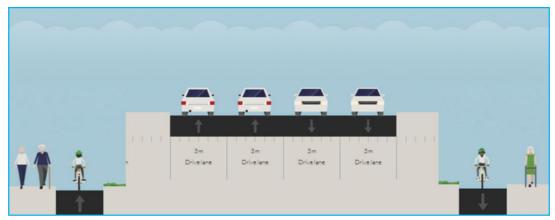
Potential Cross Section for the R157 between Summerhill and North Dunboyne Accesses
